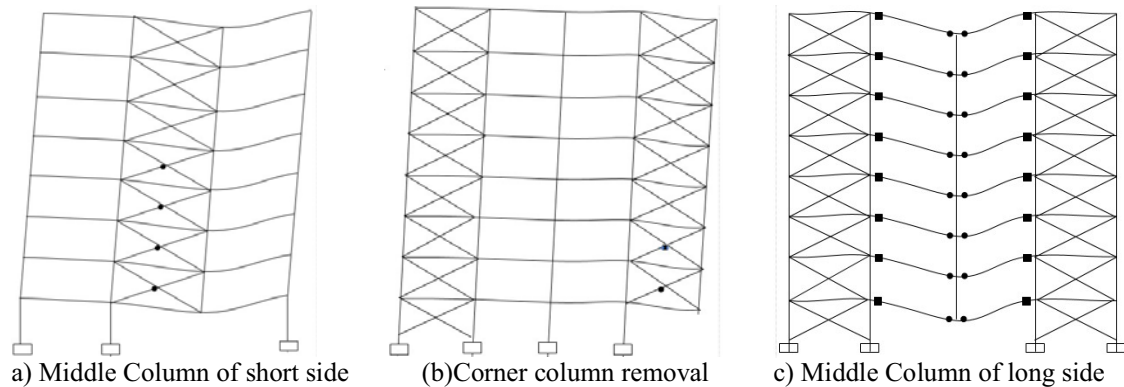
Deformed shape and plastic hinge state for the Bay wise bracing system
